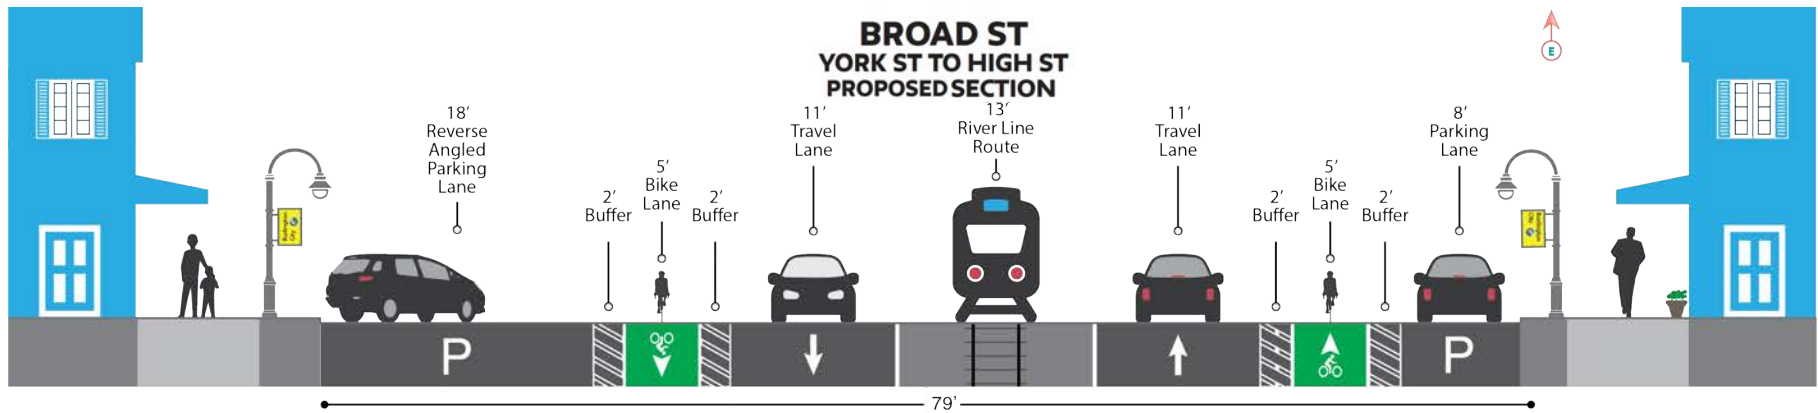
Proposed Cross Section Broad Street - York Street to High Street
